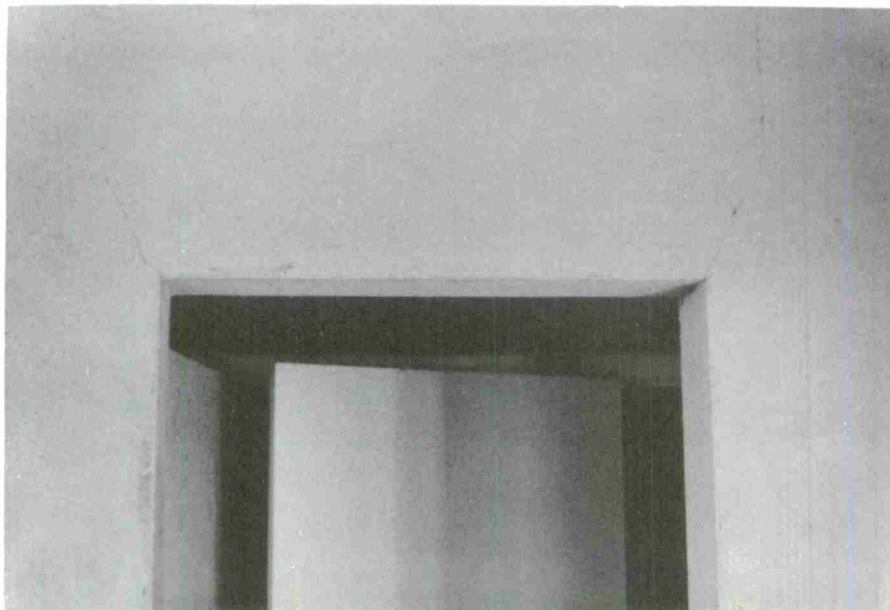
Pretest Plaster Cracks, Kitchen Door
